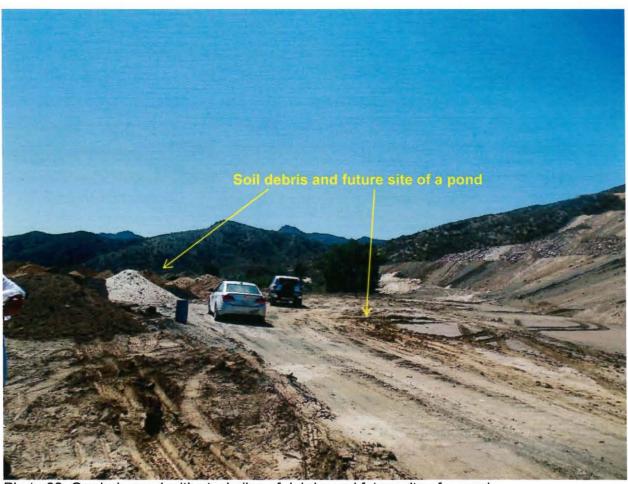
Graded area 1 with stockpiles of debris, and future site of a pond.
